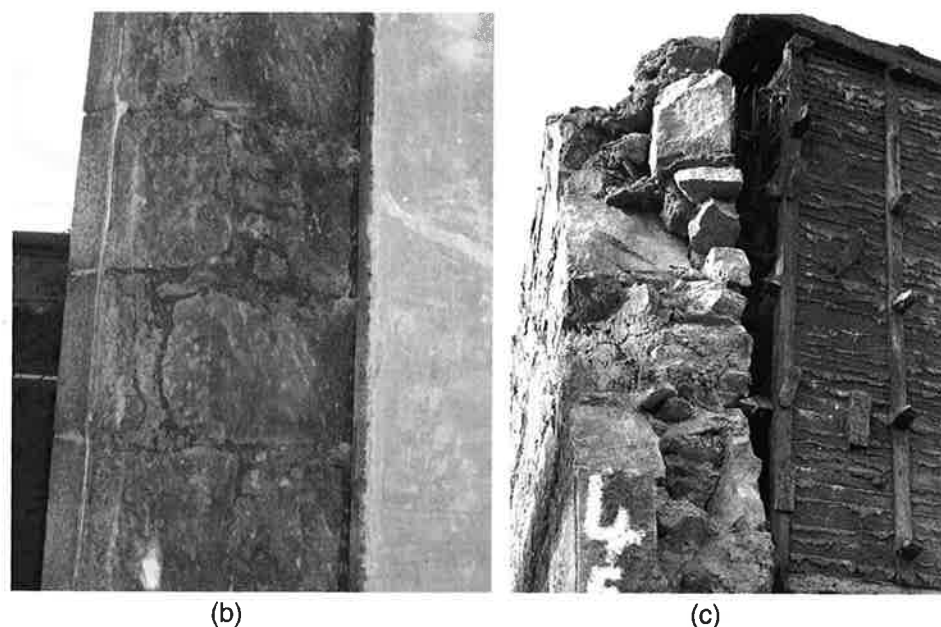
(Continued) (b) granite wall at window ingoe; (c) partly demolished granite wall
